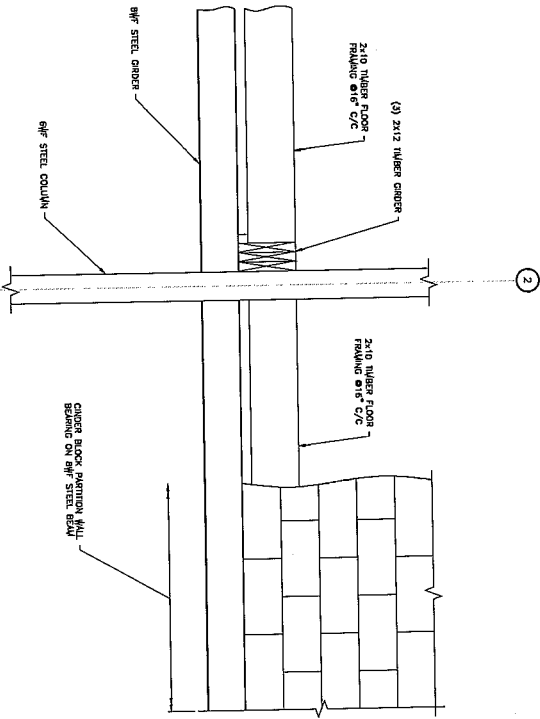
General view of framing elements at underside of Office Space First Floor (or Sanctuary Level) - Grid F/2
